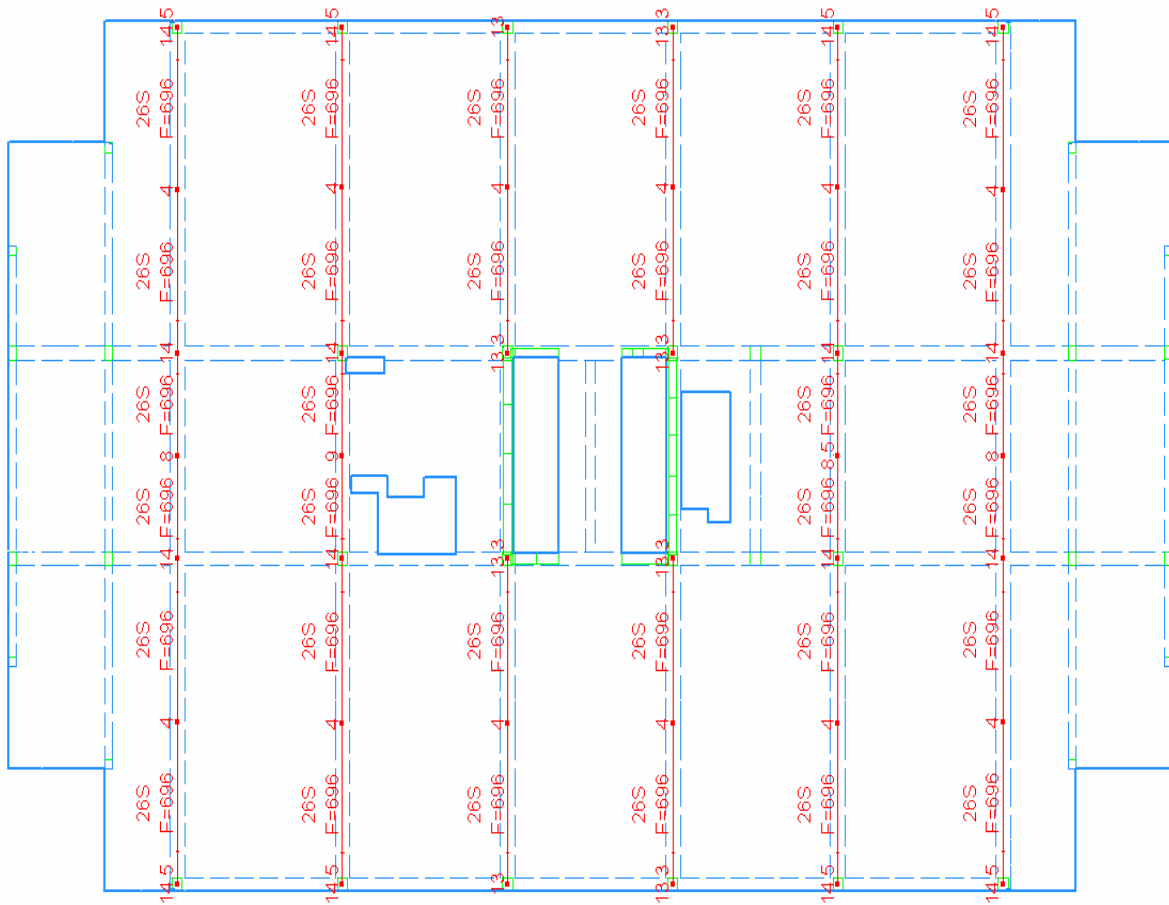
Longitudinal tendon plan view with tendon forces labeled
